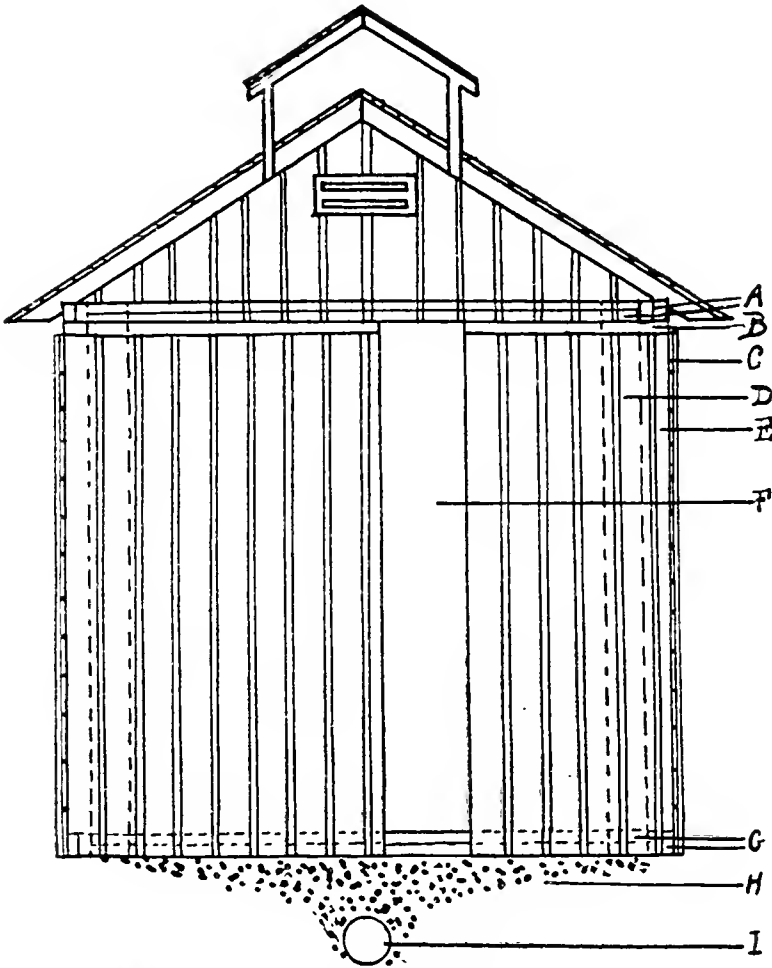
Well-built farm ice house. Elevation: A, plates; B, 6-inch open space between weather boarding and plates; C, weather boarding; D, posts (shown in dotted lines); E, studs; F, opening for ice; G, sills; H, gravel for drainage; I, tile.
